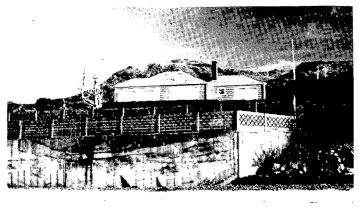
A variety of sea cliff protection approaches have been employed on the Oregon coast, mainly involving log sea walls, concrete sea walls and riprap.
